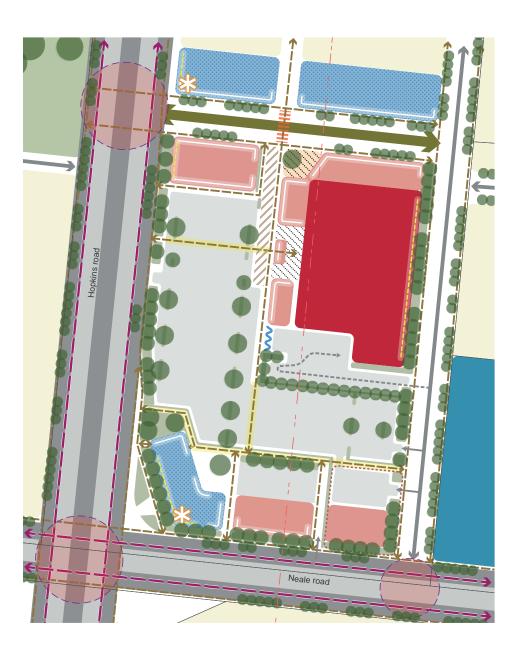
Kororoit Town Centre Concept Plan (Indicative only)
